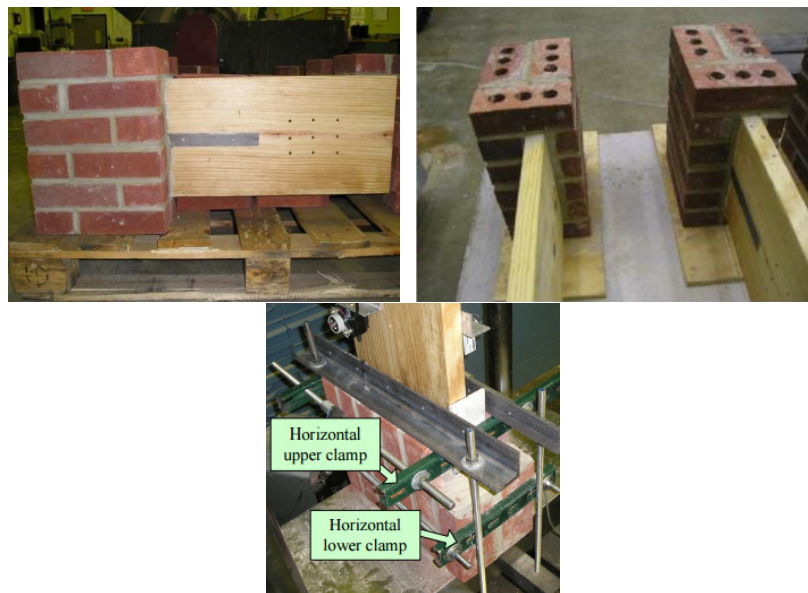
Test specimen of wall-diaphragm connection. (Lin and LaFave, 2012)
